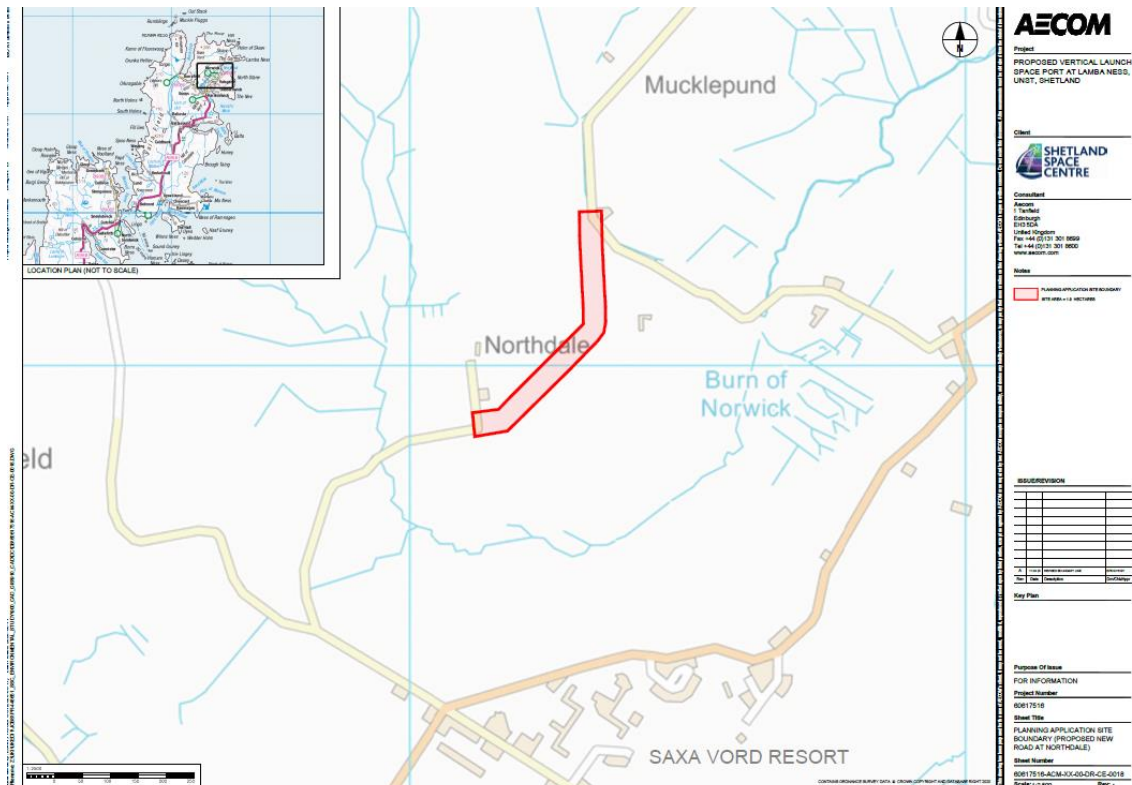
Proposed New Section of Access Road Boundary (red line) and the Burn of Norwick.
